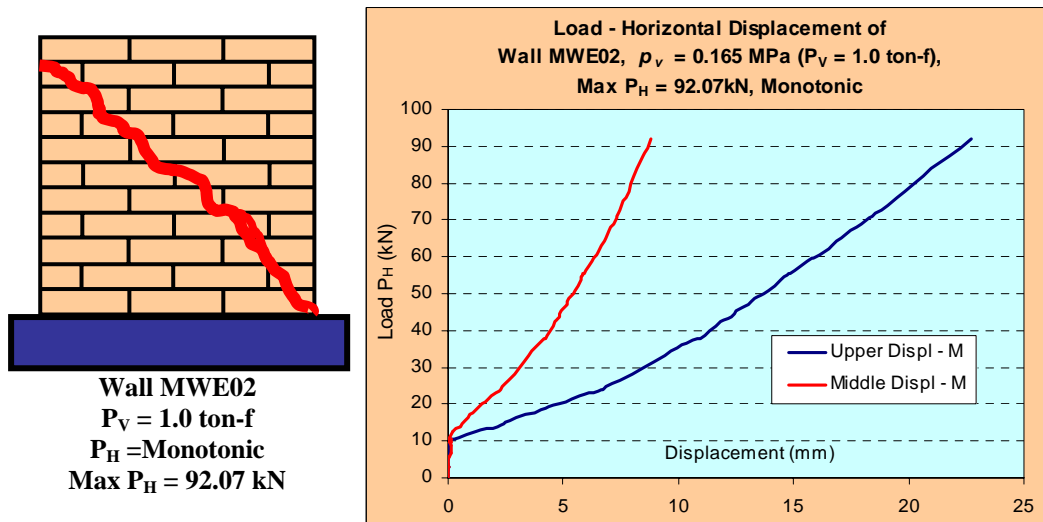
Failure pattern and load-displacement of wall MWE02
